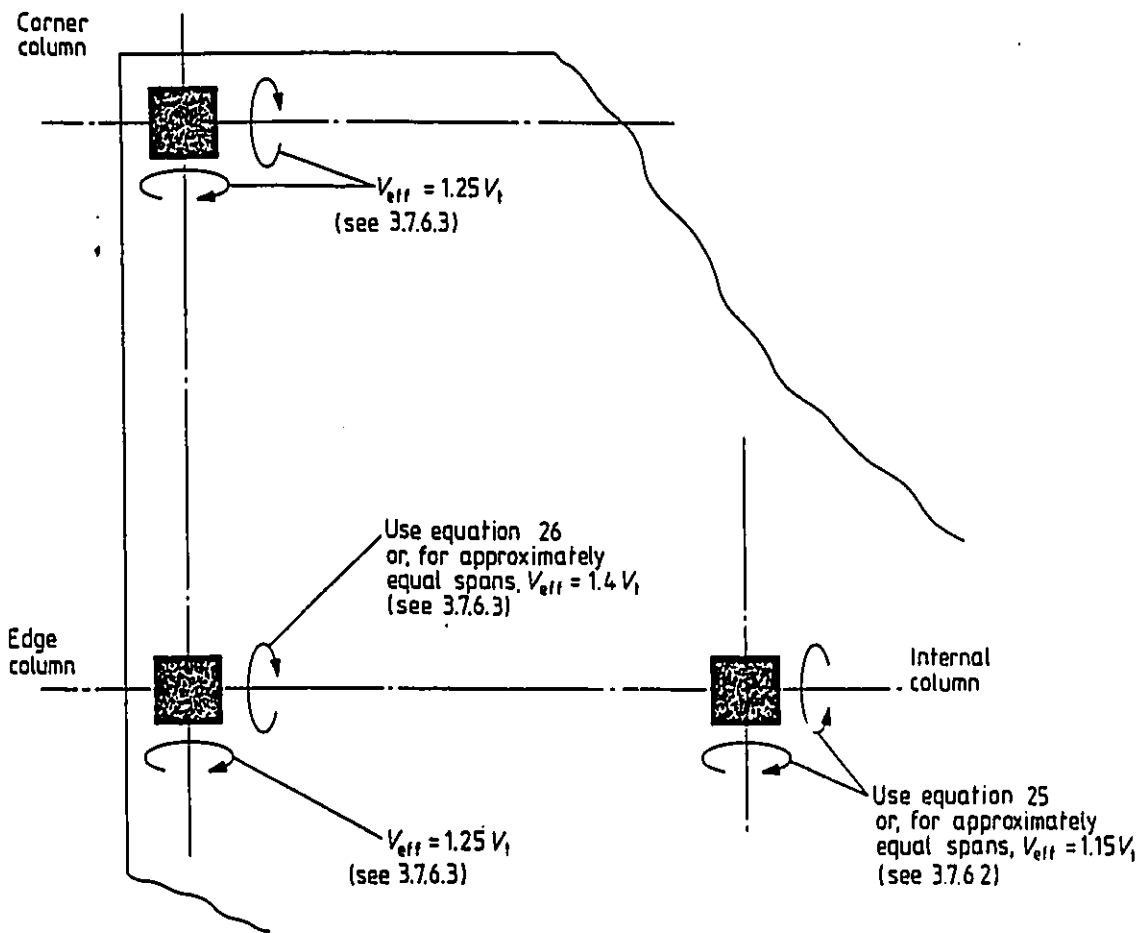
Shear at slab-column connections (BS 8110-85)
